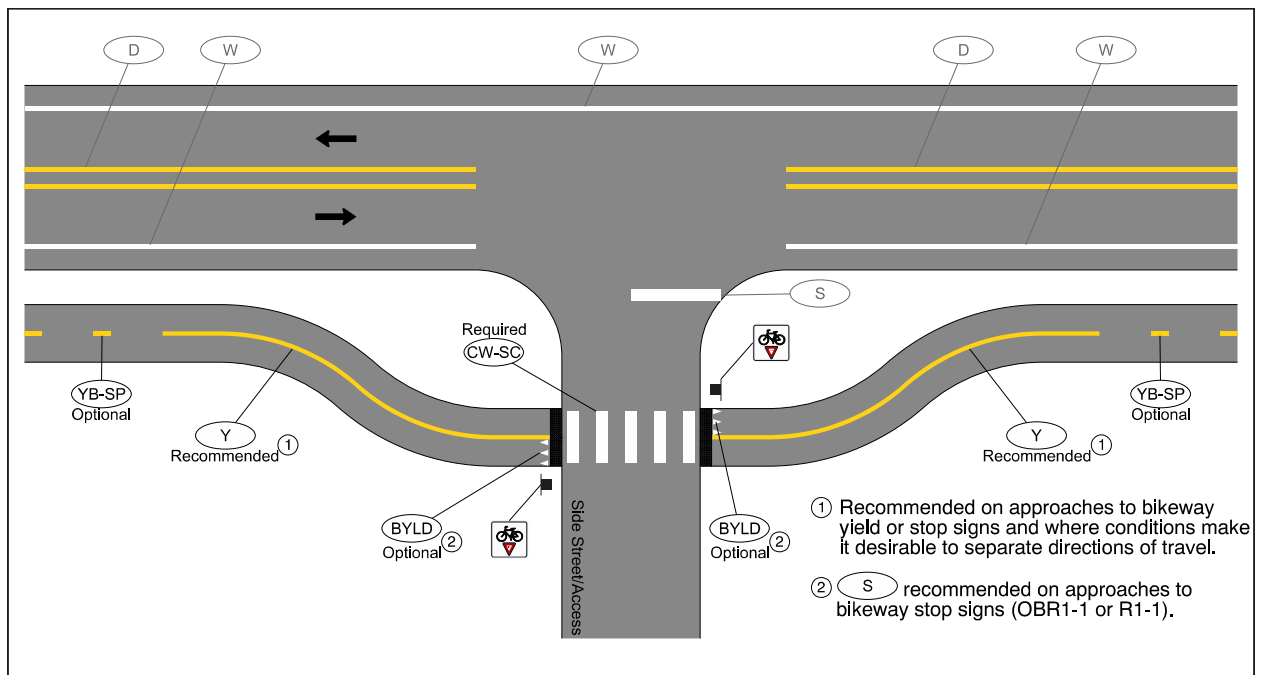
G: Typical Sidepath Markings at Minor Street Intersection with Separation from Intersection and Sidepath Yield Controlled
